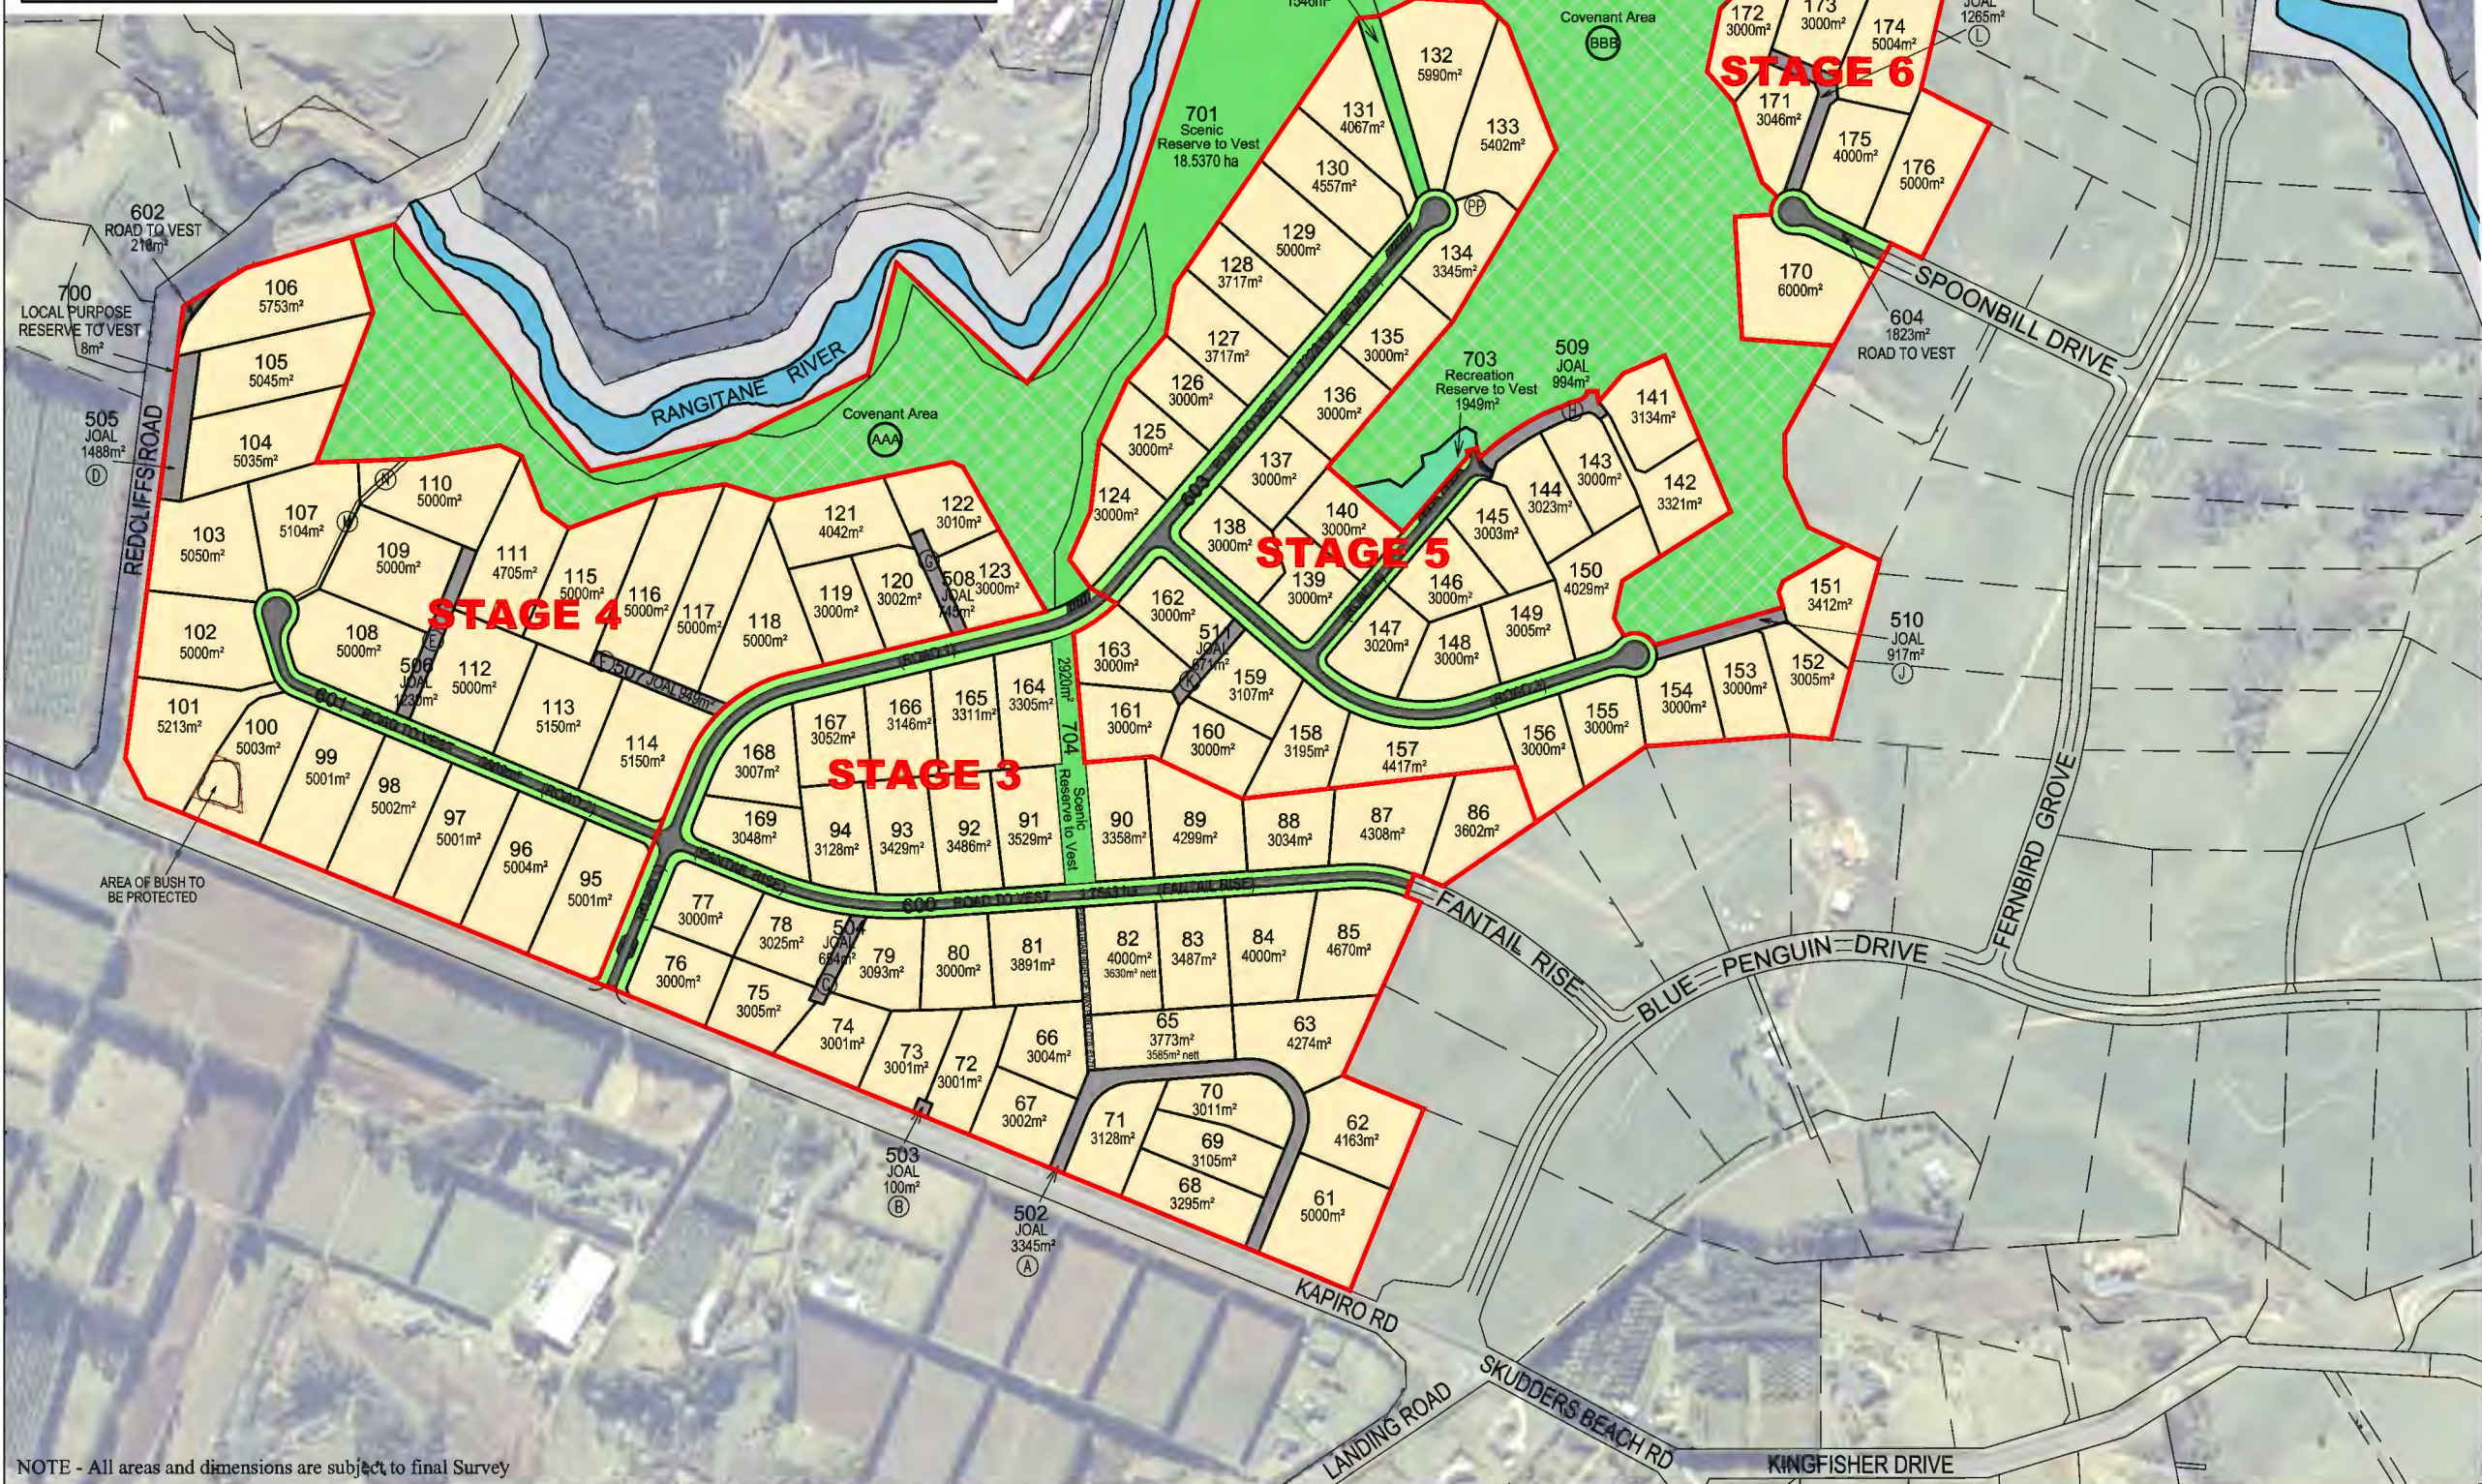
Proposed revised layout to the south-eastern corner of Stage 3
